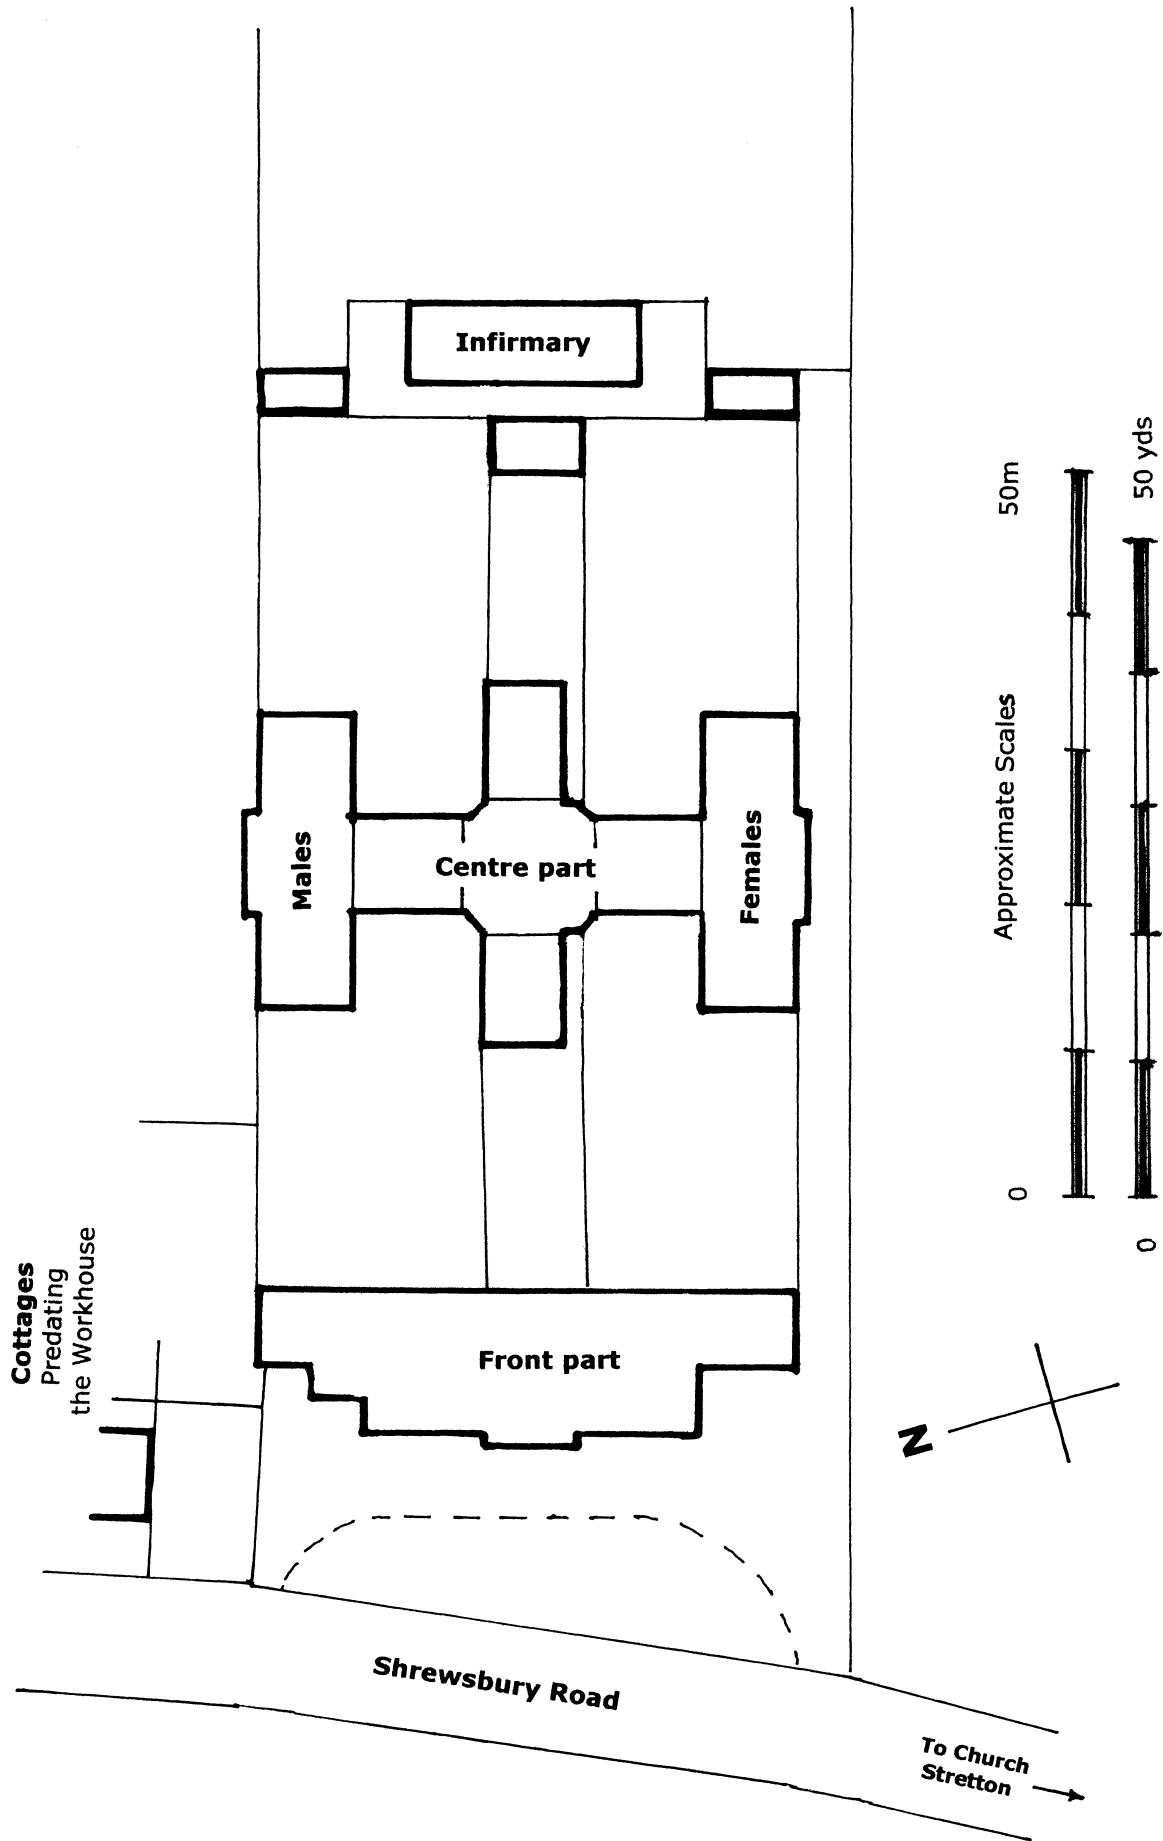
Church Stretton Union Workhouse. (Conjectural plan based on the Tithe Survey plan of Church Stretton, 1840, and Ordnance Survey, 1883, showing the three blocks as planned.)
